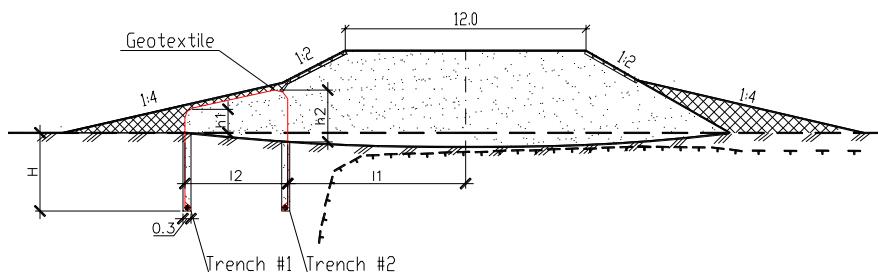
Constructional and technological solution for roadbed stabilization on road section №1 (PK 594+00 – PK 594+90).
